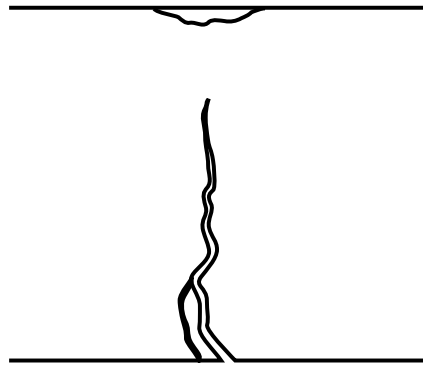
Sketch of failure pattern for beam B8b. Beam B8b failed in flexure.
